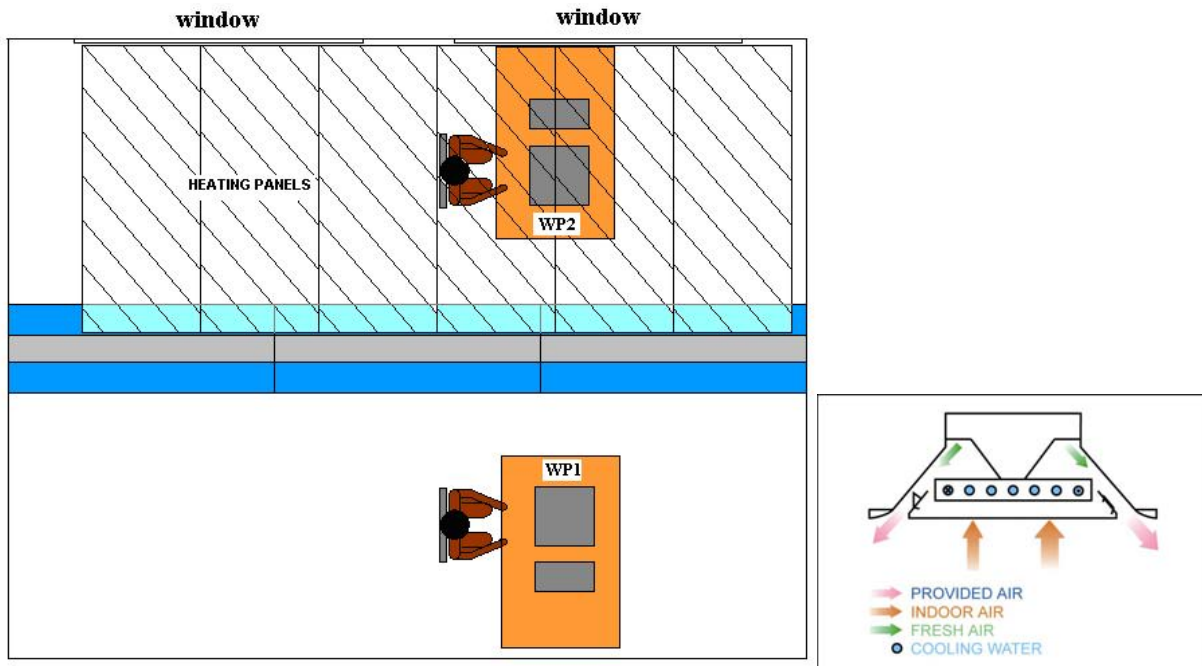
Experimental set-up in the room and sketch of cross section of the chilled beam with right shutter closed and the left shutter open is shown as example.
